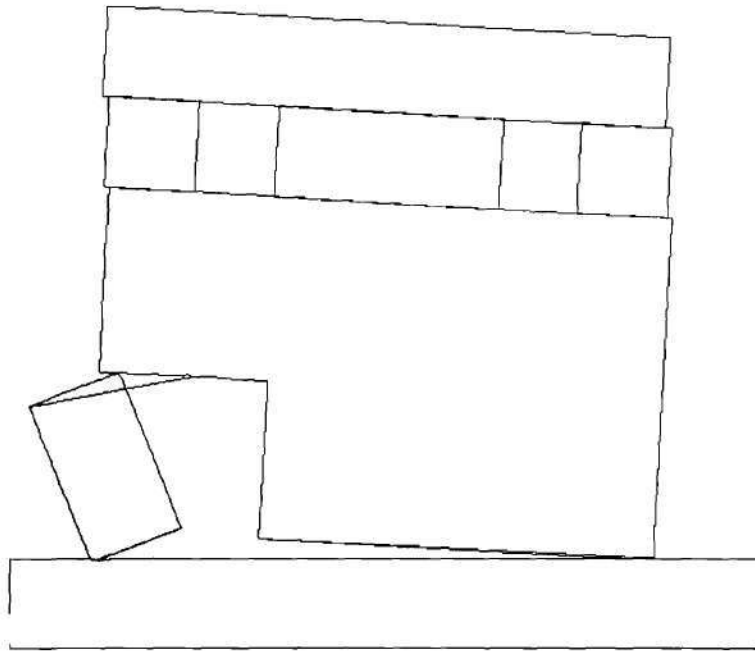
Deformed shape of Wall1 (loaded to the left)
